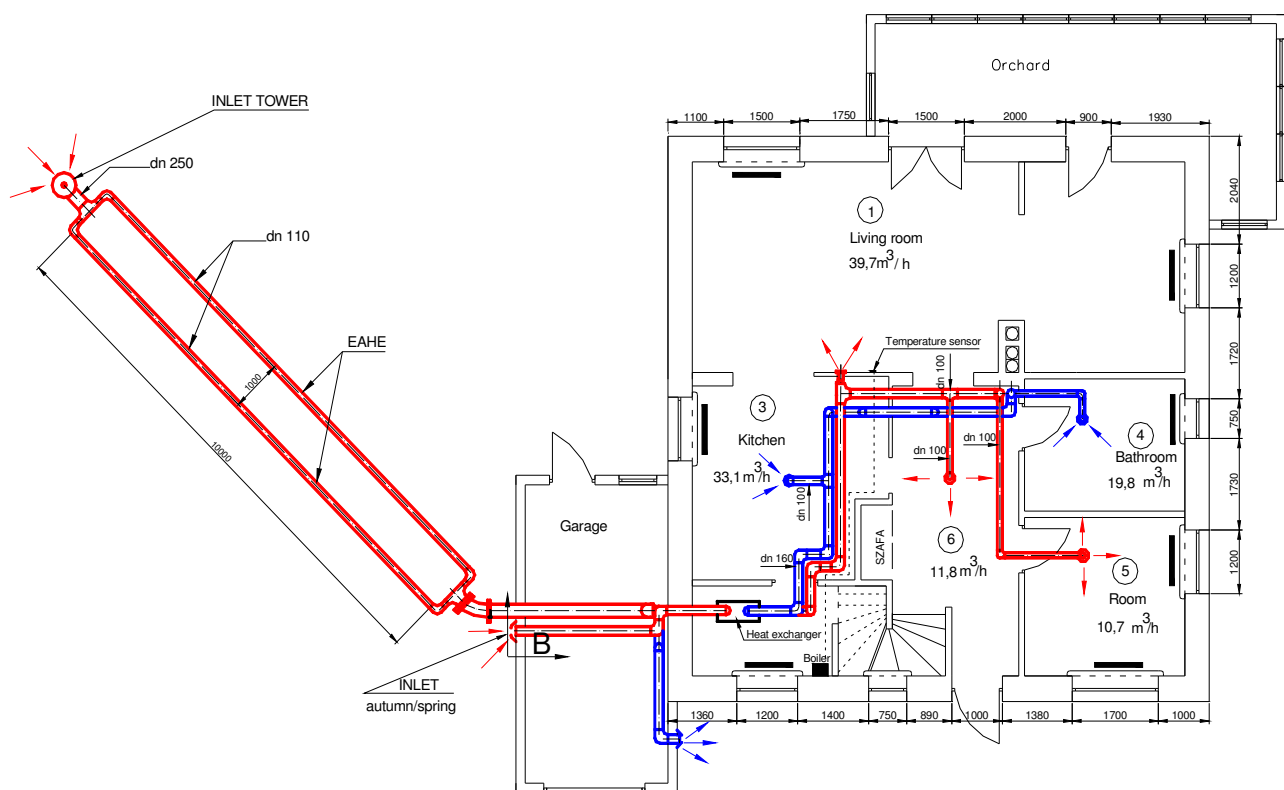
Plan of ground floor and ventilation system (designed by Pawel Kwasniewski)
